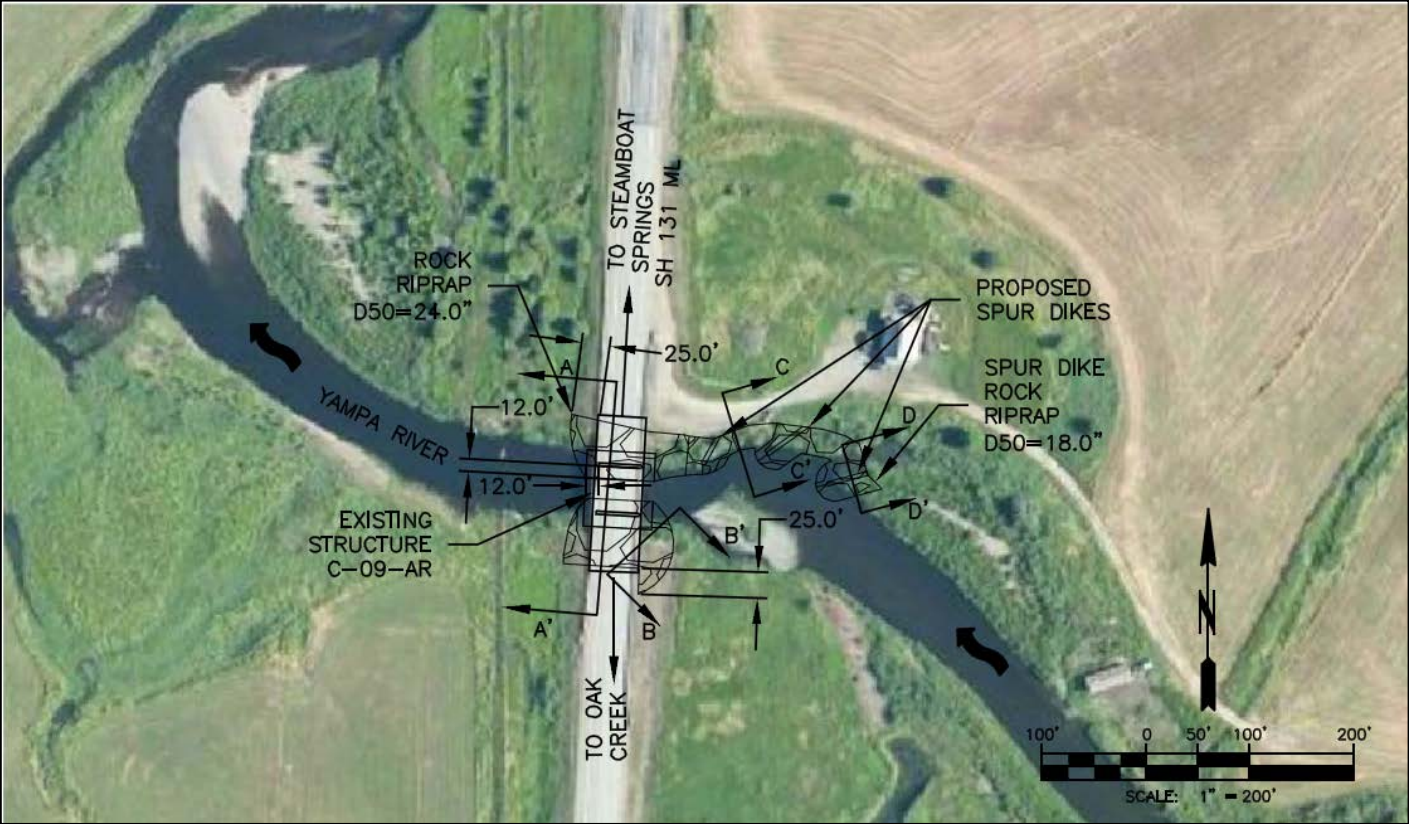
Plan view of Bridge C-09-AR with recommended hydraulic scour countermeasure locations
